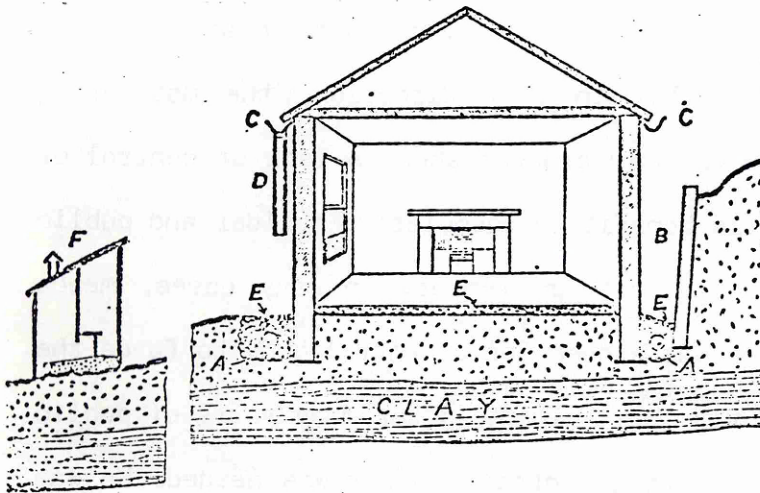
Remedies applied to fig. 1. A, drain surrounded by rubble; B, air-space round the house; C, rain gutter; D, full pipe; E, concrete surface; F, privy removed to lower level.
